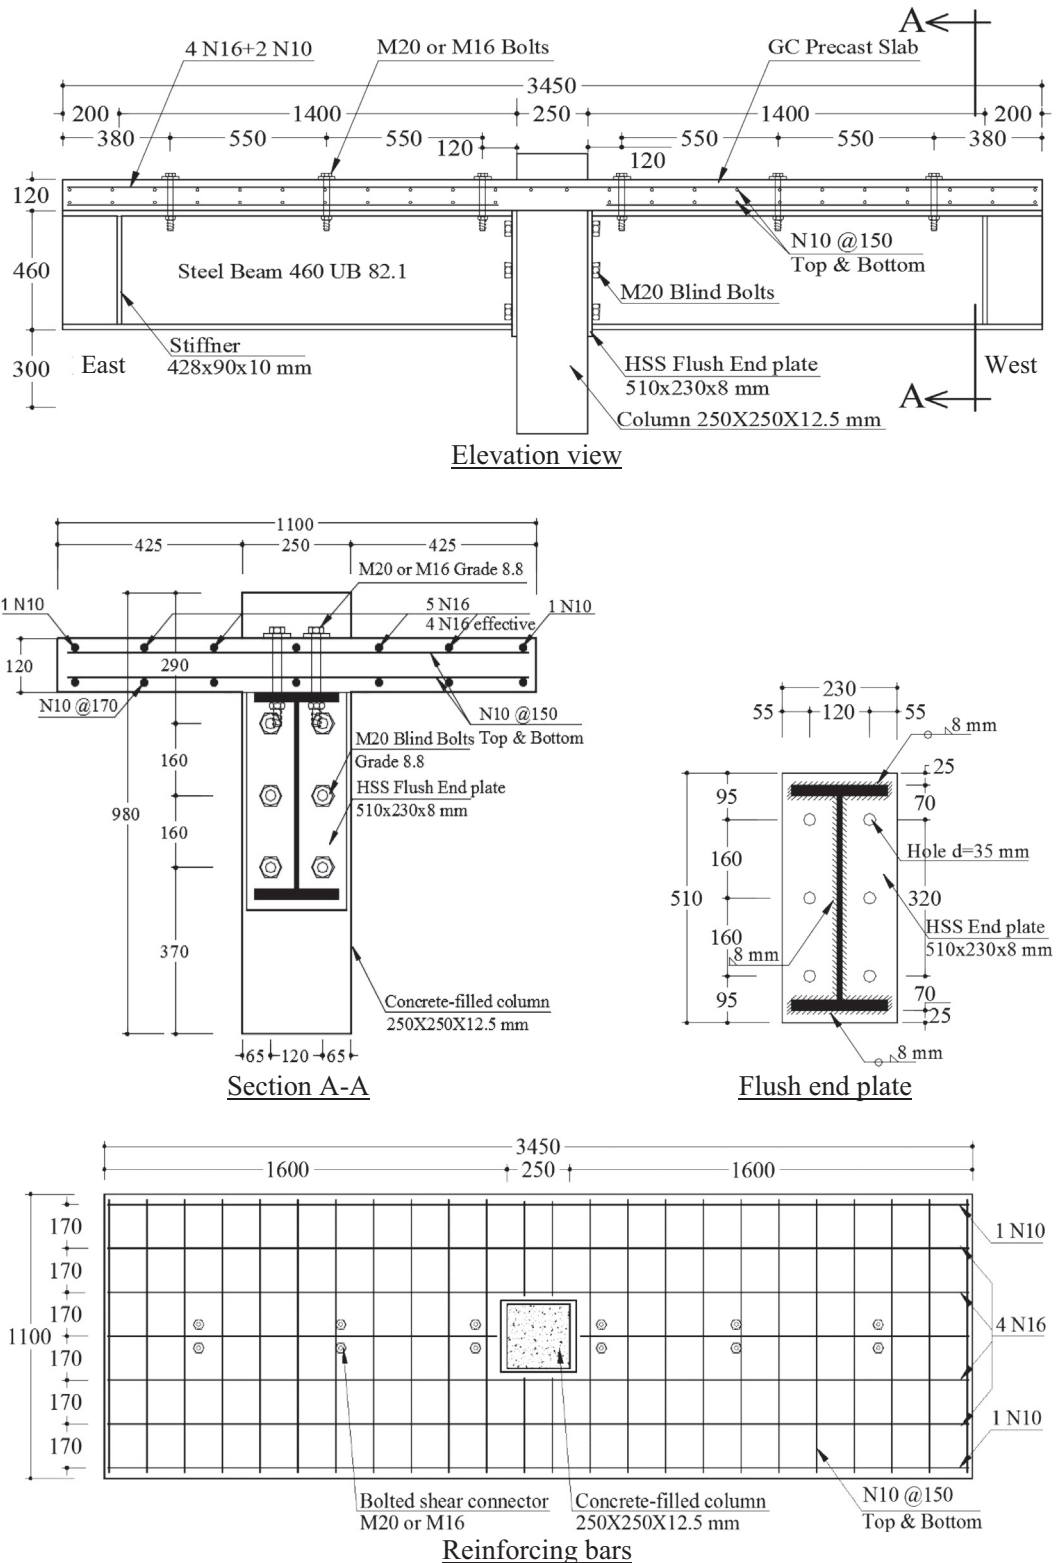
Geometry and details of joints CJ1 and CJ2 (unit: mm).
